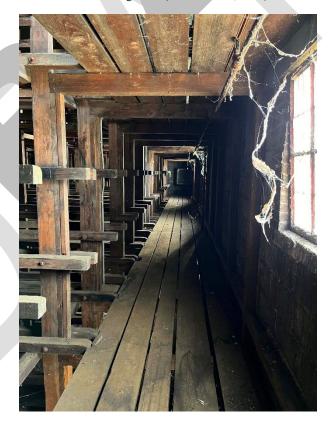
Interior view of Bonded Warehouse 1B barrel ageing rack room in the 1934 section of the building (Volume A). Camera facing south (November 17, 2023).
